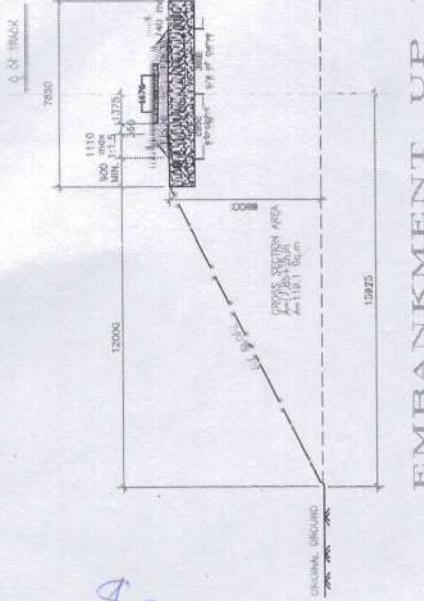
DETAILED OF TRACK STRUCTURE 60Kg. RAIL
